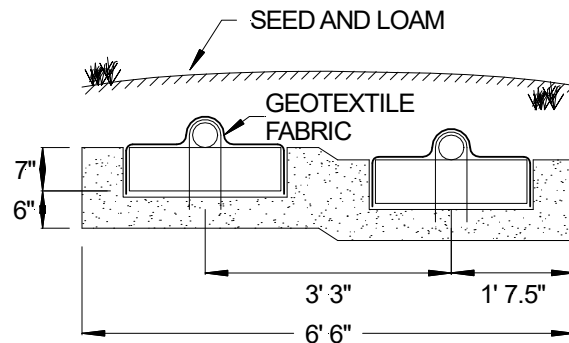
SECTION VIEW – BED SYSTEM EXAMPLE – SLOPING SITE
